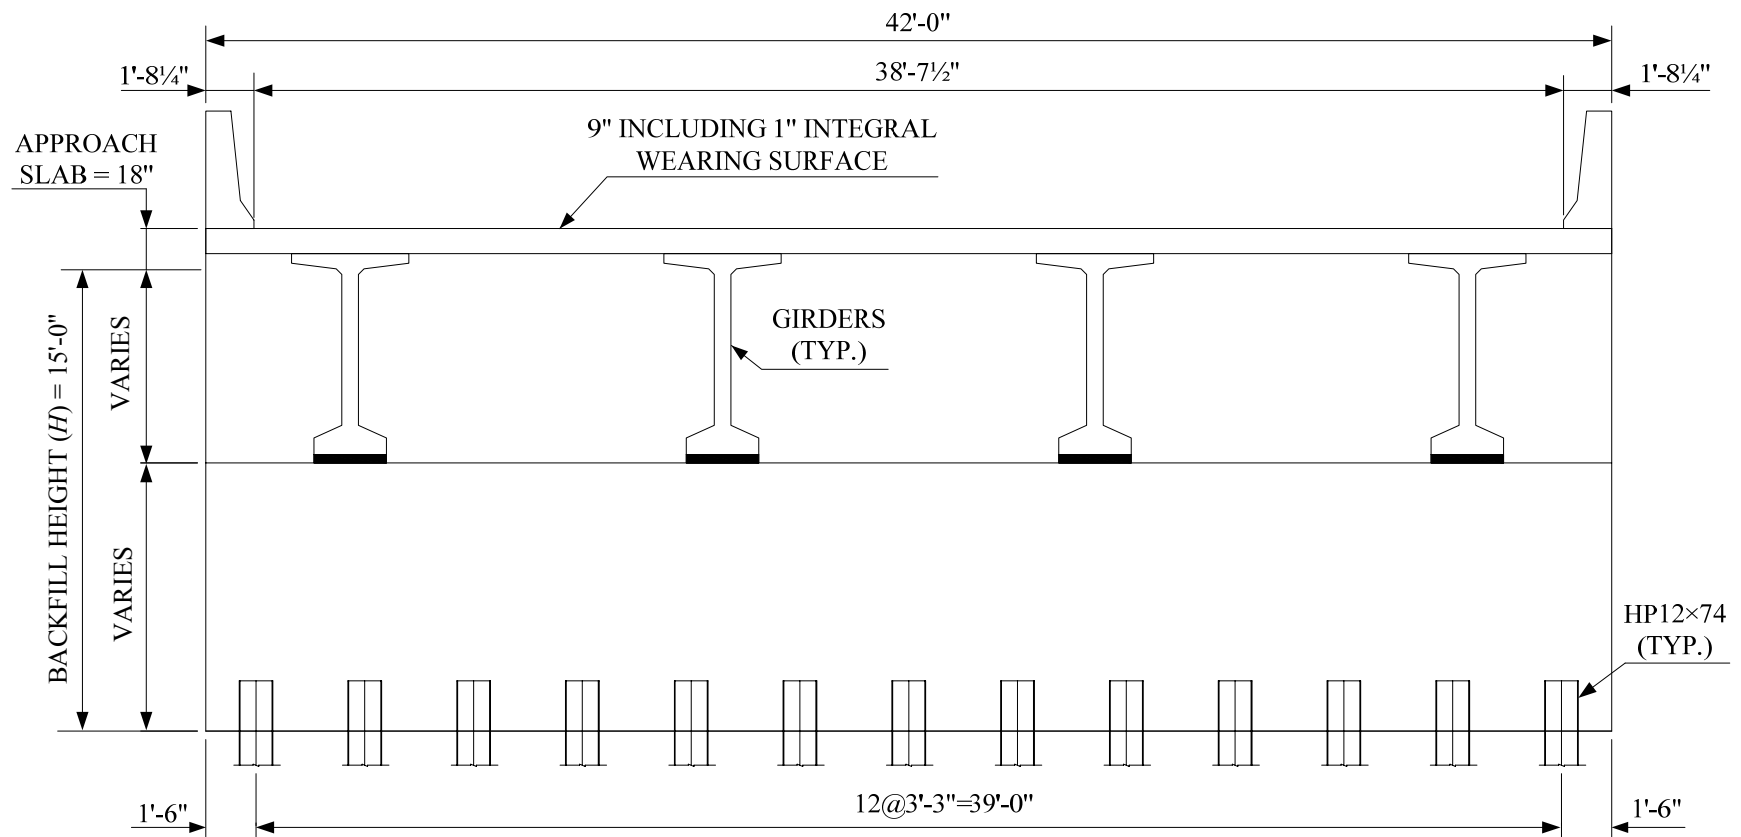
Typical Example Bridge Cross-Section and Abutment Dimensions.
